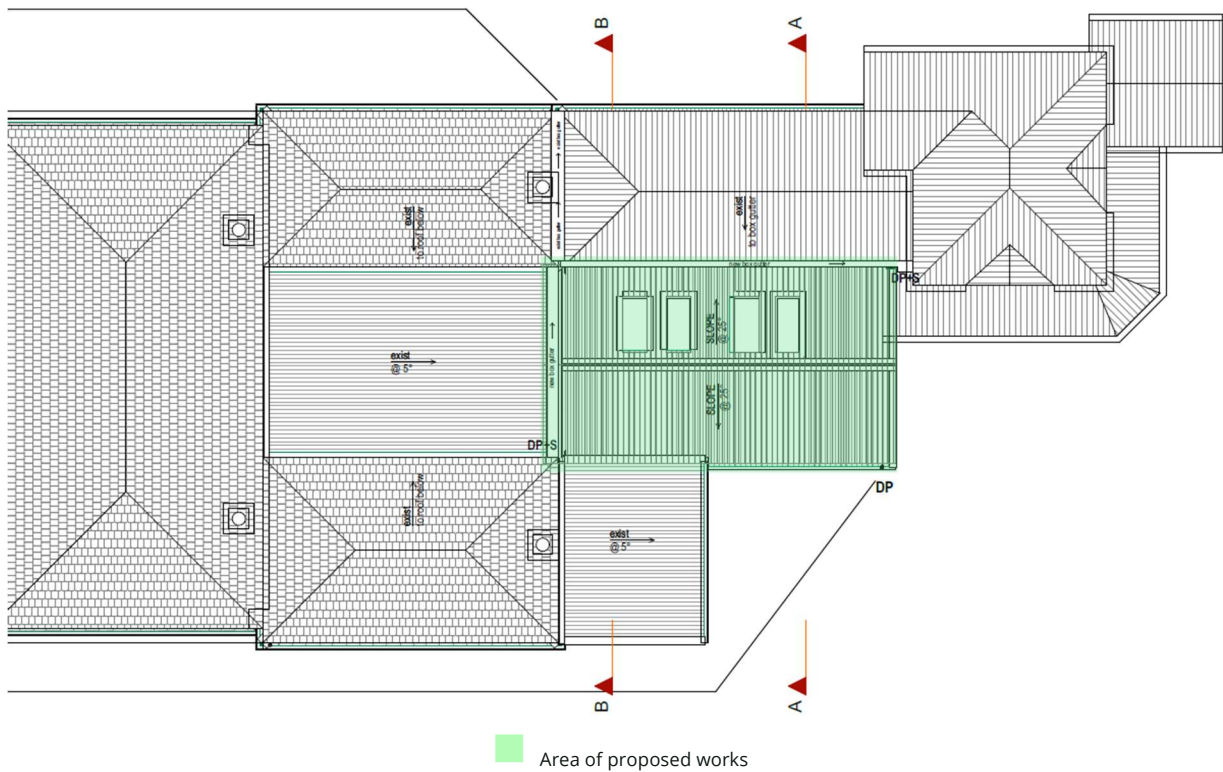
proposed roof plan (plan by J3 Design, 2024)
